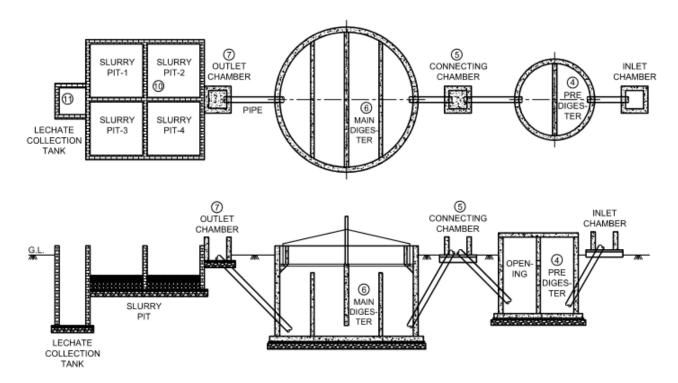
CROSS SECTIONAL VIEW OF A BIOGAS PLANT
